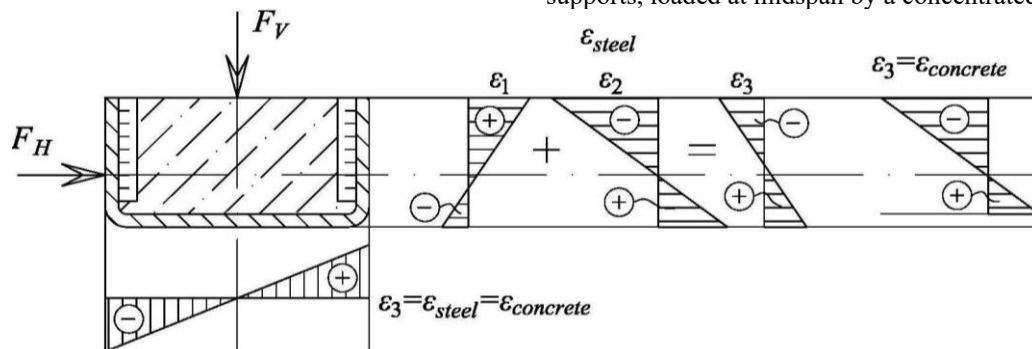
Sketches of the relative strain distributions in the cross-sections of the prestressed steel-reinforced concrete bar structure under biaxial bending (for the support and loading scheme of the structure, see Fig. 1).
